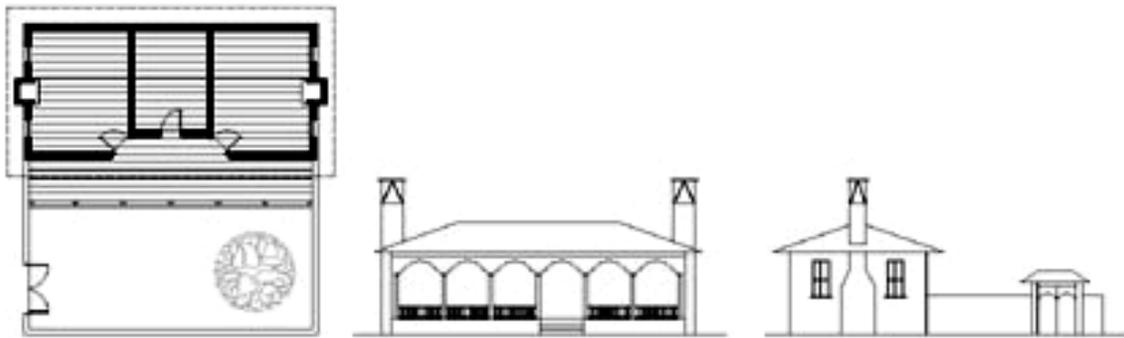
Schematic drawings of type 2 house in Ula. Plan (left), front elevation (middle), side elevation (right) (Drawings by author)
